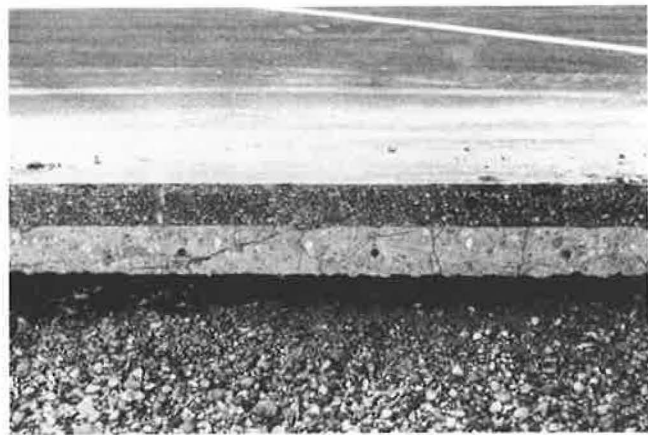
Cut-away section of asphalt overlay of cracked and seated pavement.
